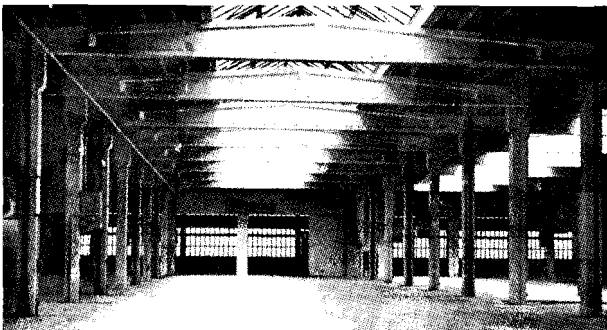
Interior view of a single-storey factory hall showing the precast framing
